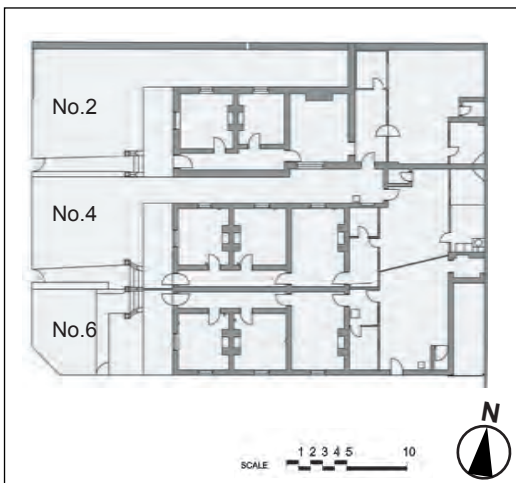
Zone Q Nos. 2, 4 & 6 The Terrace Floor Plans
